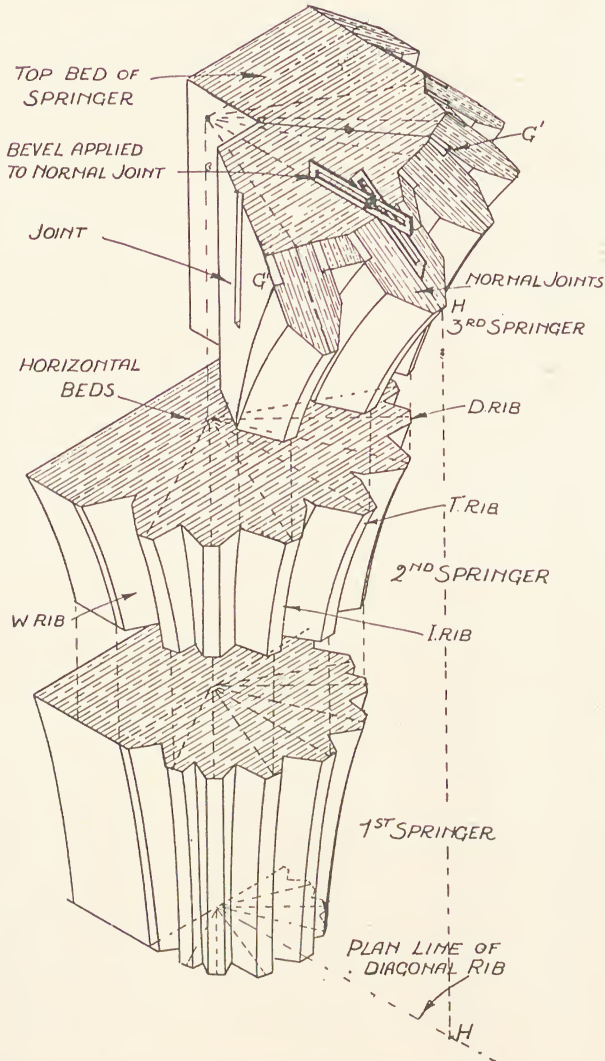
SKETCH OF SPRINGERS SHOWING BEDS AND JOINTING.
